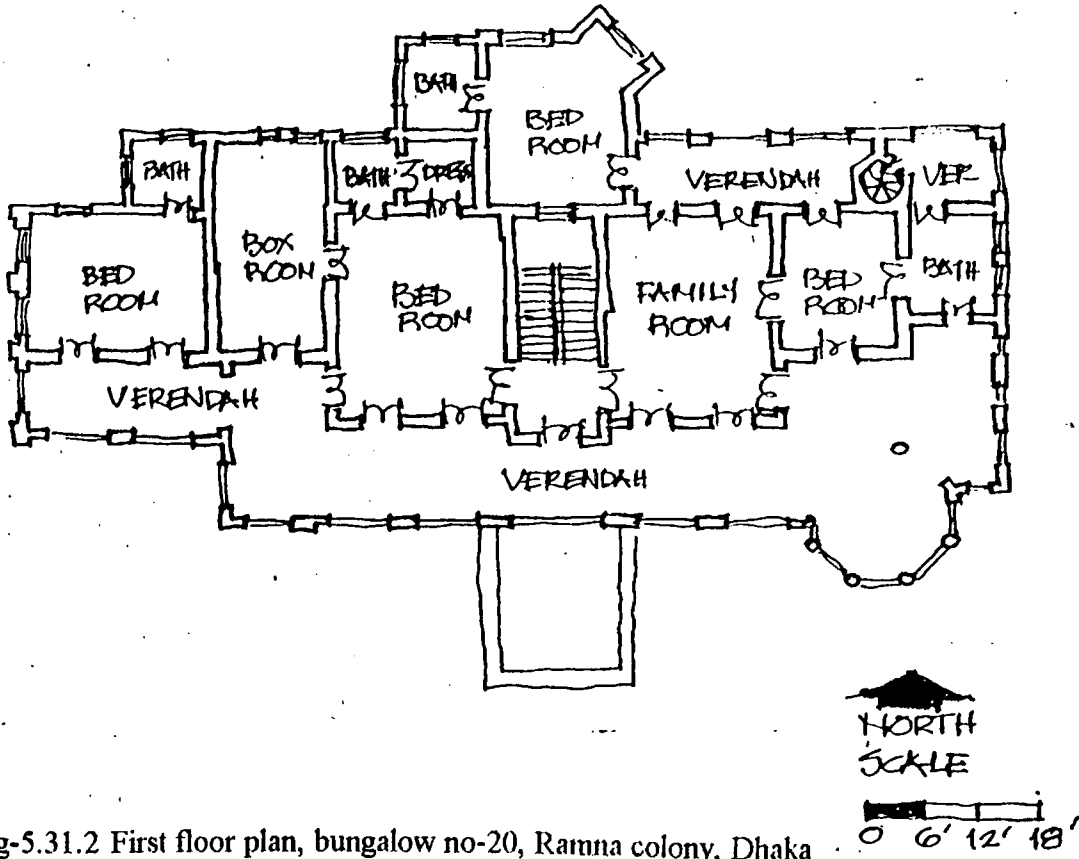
First floor plan, bungalow no-20, Ramna colony, Dhaka
